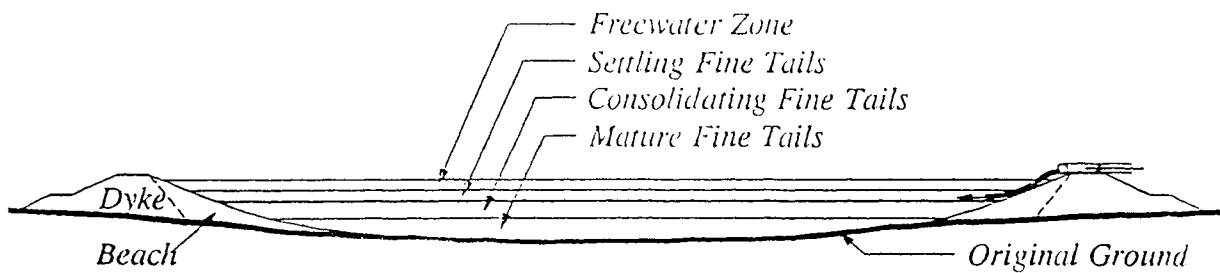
Schematic of Mildred Lake Settling Basin cross section.
